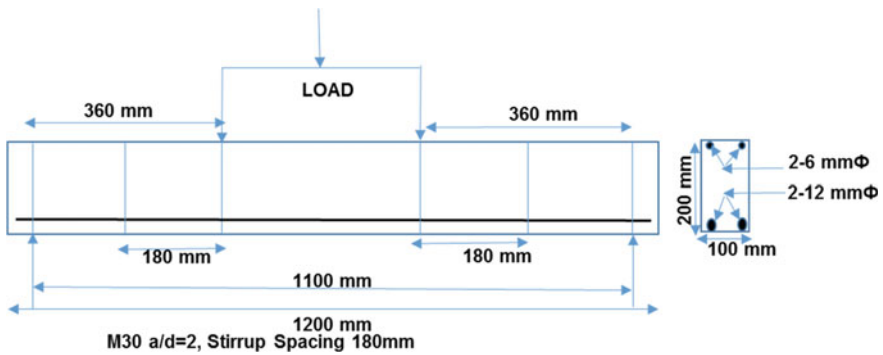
Details of reinforcement for M30 SCC with $a/d = 2$
